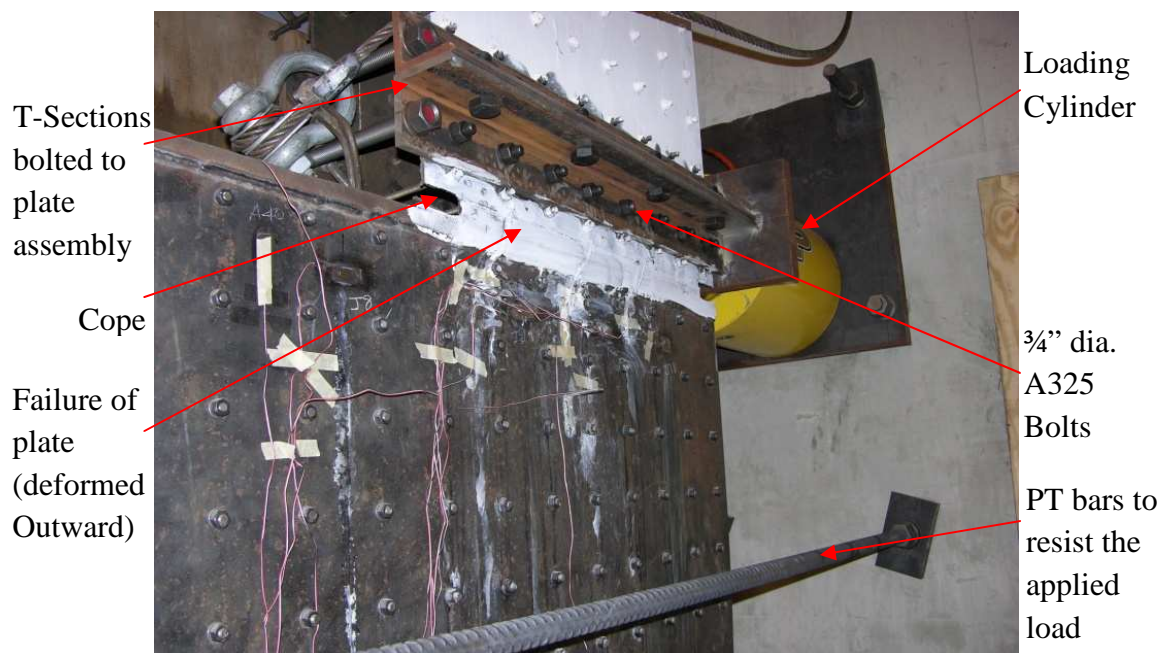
Failure of the Horizontal Connection - Test-1: View 1
